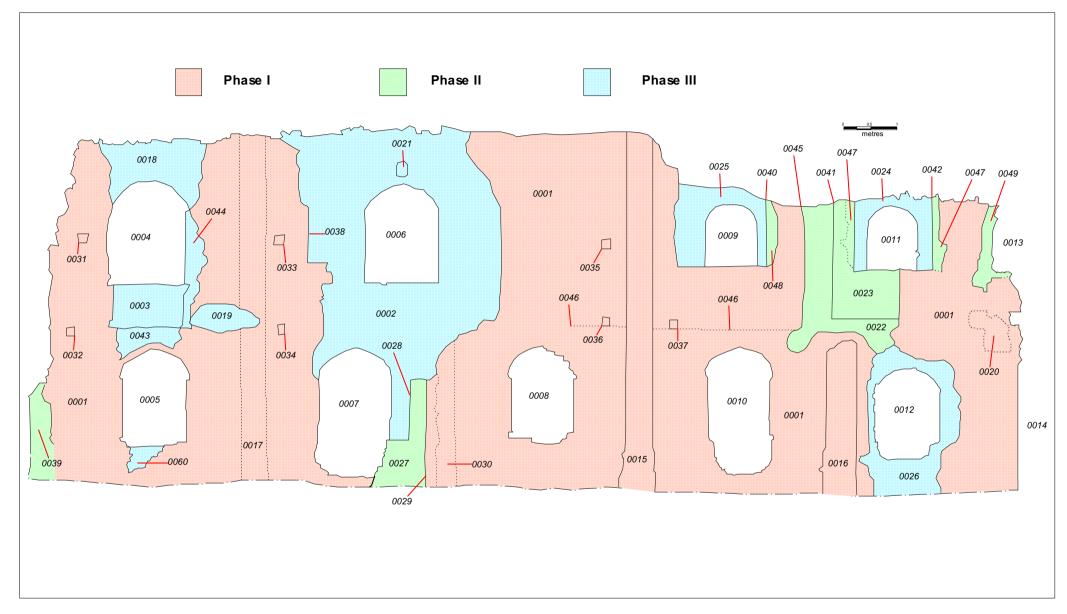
c.*1:70 elevation of the refectory north wall *0050
